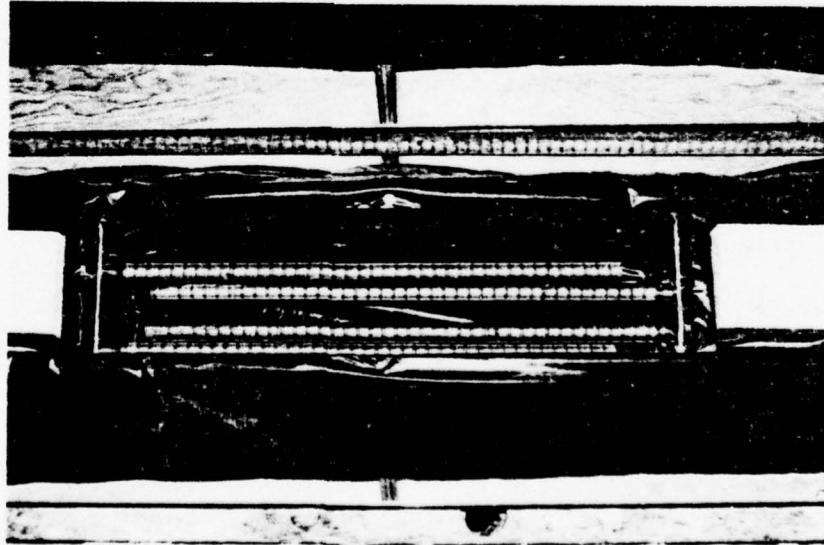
Temporary End Forms in Place in Epoxy Beam.
